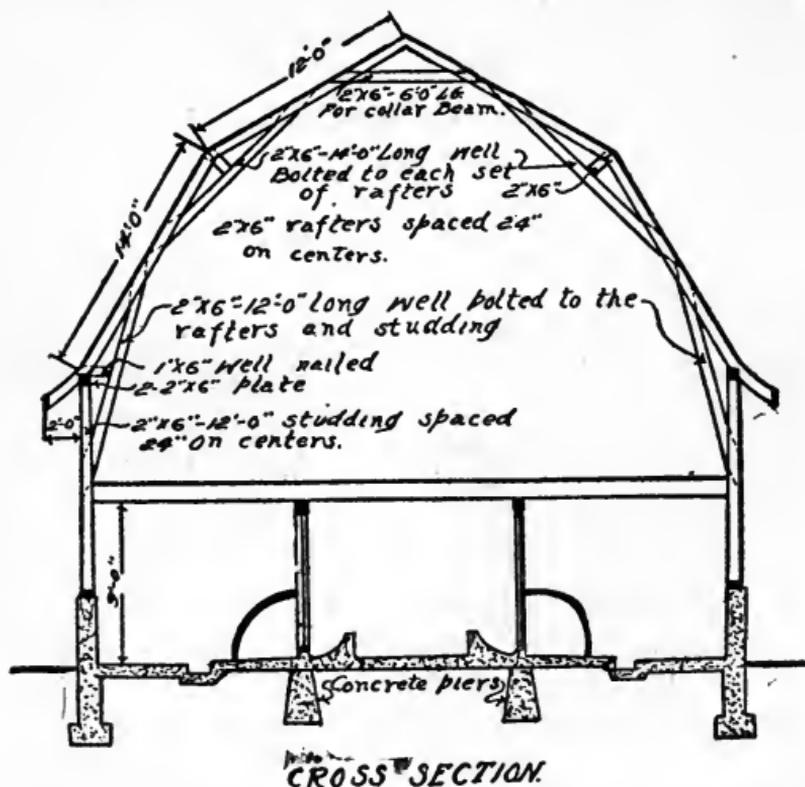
Cross Section of Curb-Roof Dairy Barn, Showing Rafter Construction and Bracing
